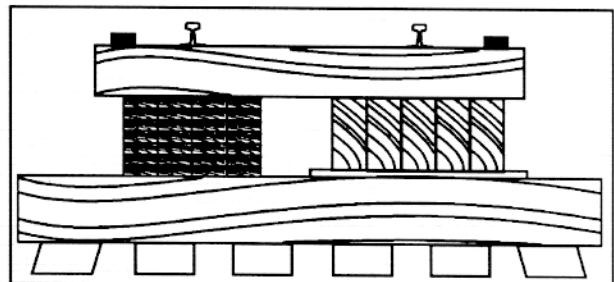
Cross Section of D'Hanis Bridge with Helper Stringer
